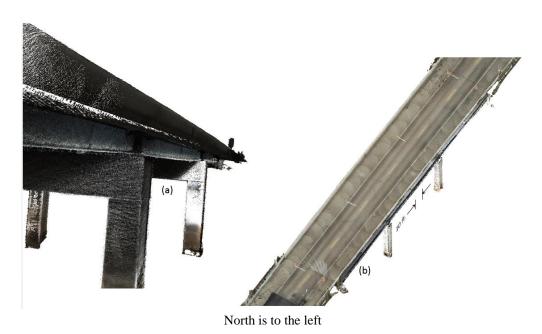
Full view of Keg Creek Bridge including bridge deck showing (a) side zoom view and (b) all three spans from above
